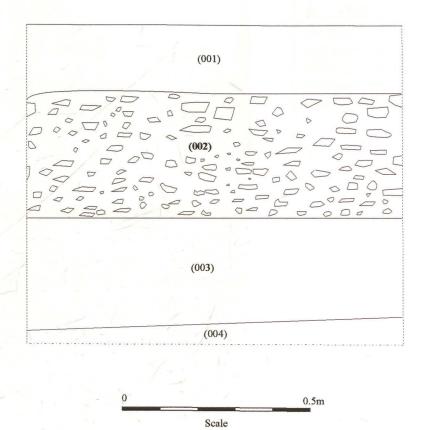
Representative west facing section from pipe trench. Shows construction layer (002) and buried soil (003). 1:10
